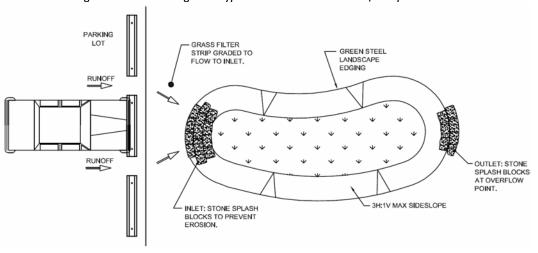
G. Rain garden typical plan view with splash blocks
